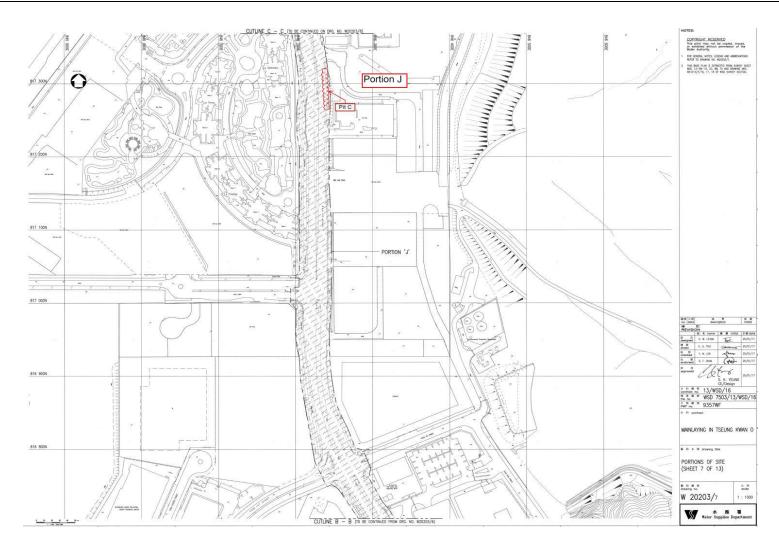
Location Plan for Portion J – CH.A 19+15 to CH.A 19+50 (Pit C)
